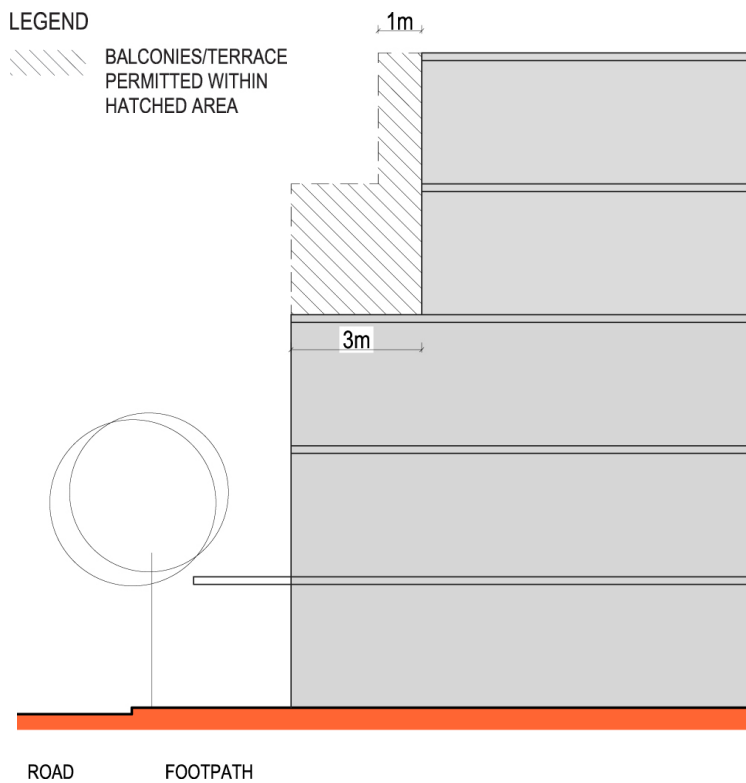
Upper Level Setbacks and balcony locations
